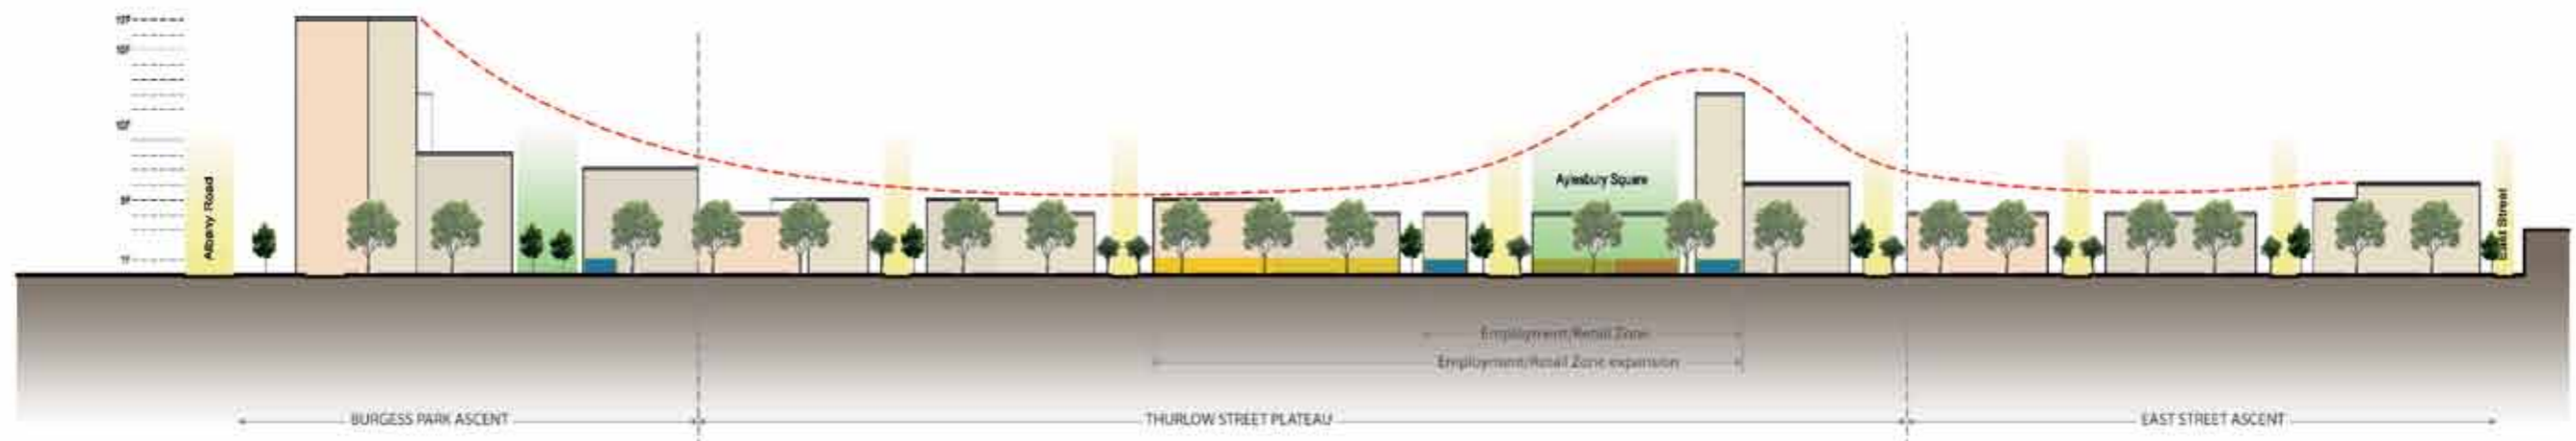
Extract from Park openness study: We tested proposals to ensure that new buildings would not block more sky than existing.
